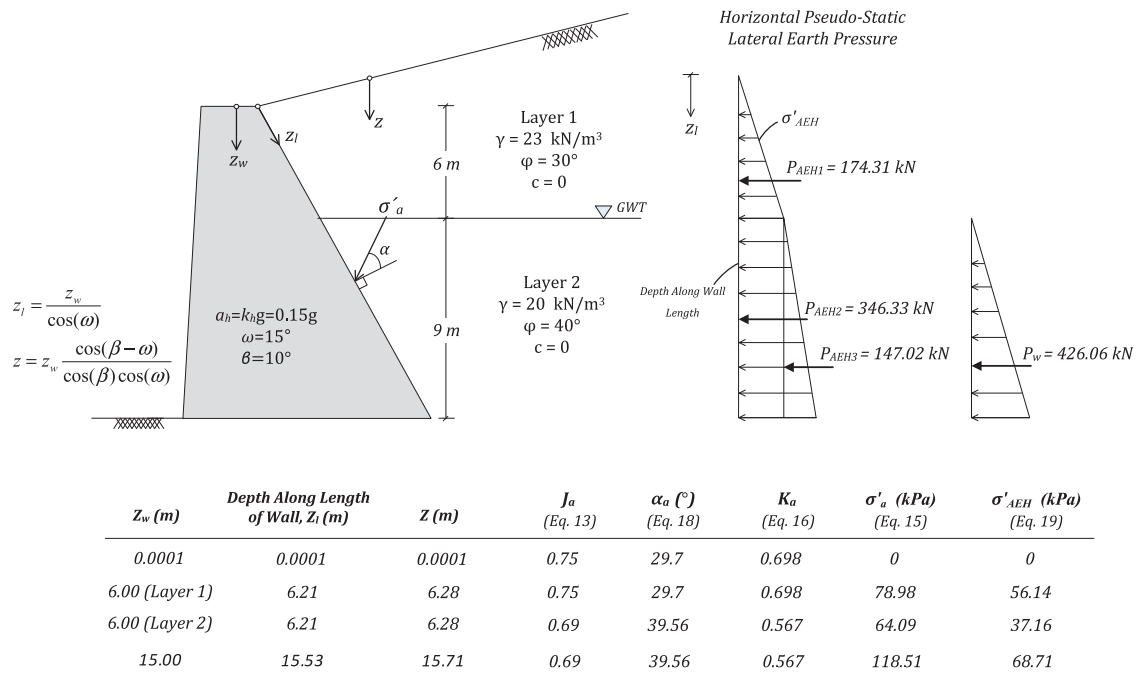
Illustrative example of inclined wall retaining sloped and layered cohesionless backfill with ground water.
